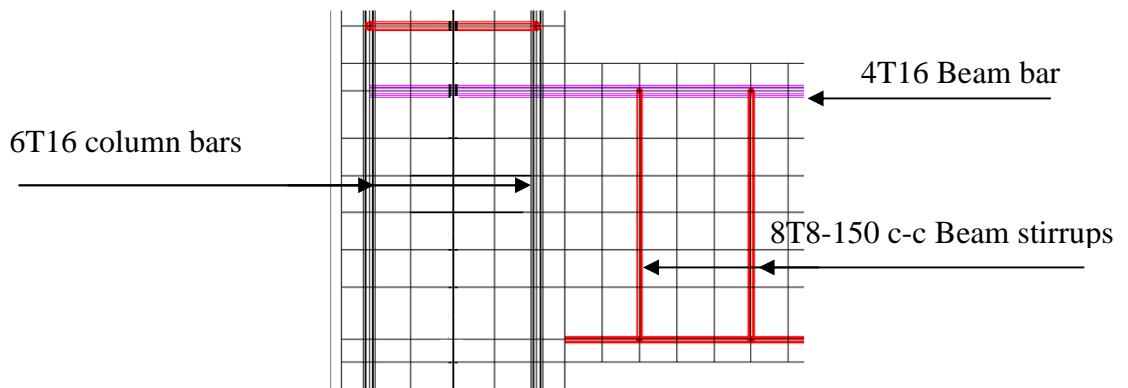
Side elevation for the concrete element and the reinforcement cage for the model of BCJ-A
